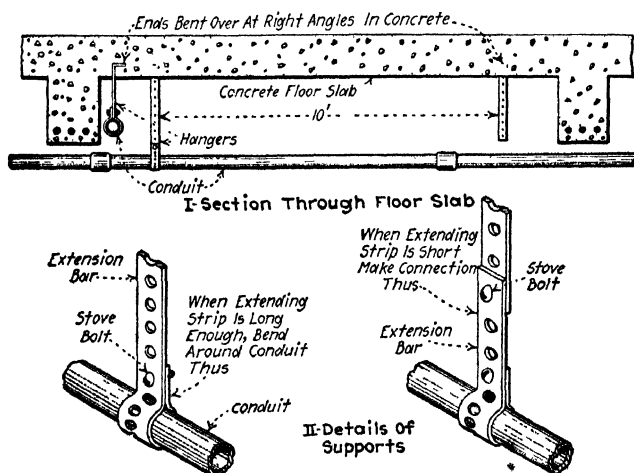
Illustrating the use of perforated extension bar for supporting conduit runs.
